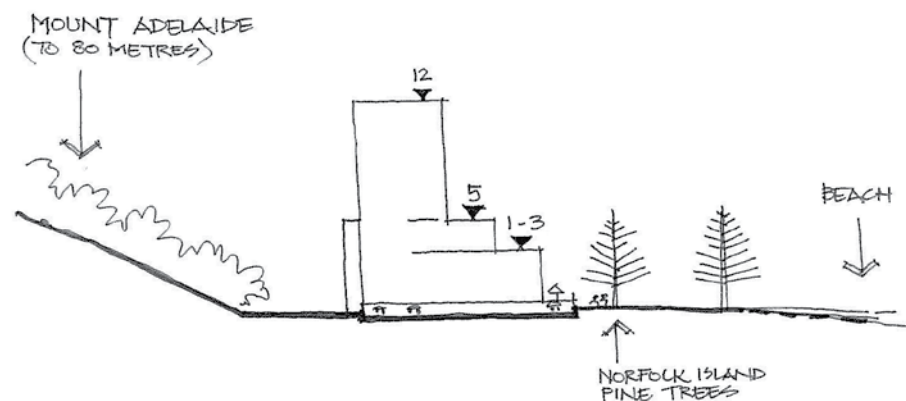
Indicative building height responding to landscape and landform - Hotel / Mixed Use Precinct - Lot 6
